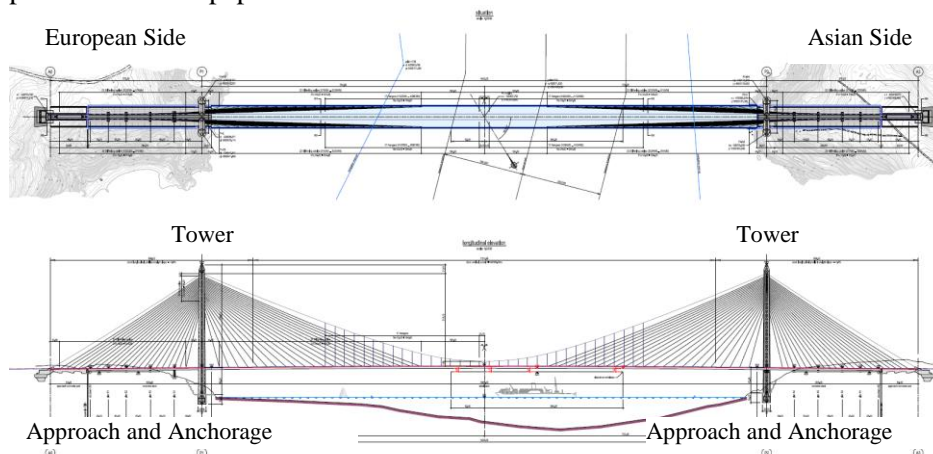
Third Bosphorus Bridge Alignment and Foundation Plan.
